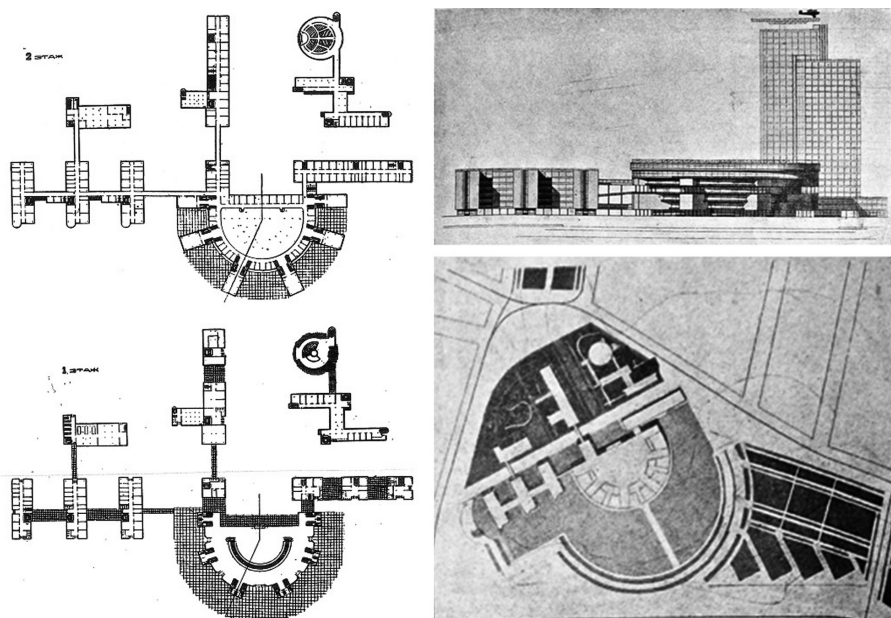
Plan of the first floor, facade and general plan of the building for the Komintern.
